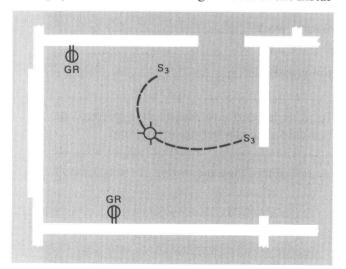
Use of electrical symbols and notations on a floor plan.
